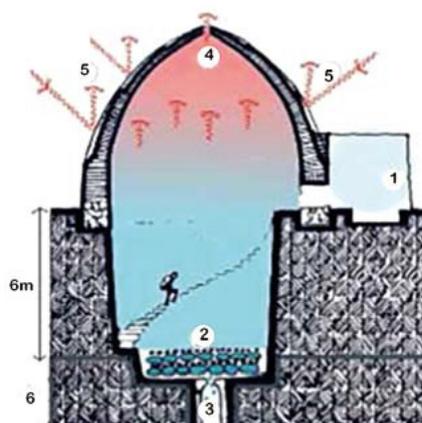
Cross-section of the ice-storage: 1 – wall, 2 – container for preservation of ice, 3 – drainage,
